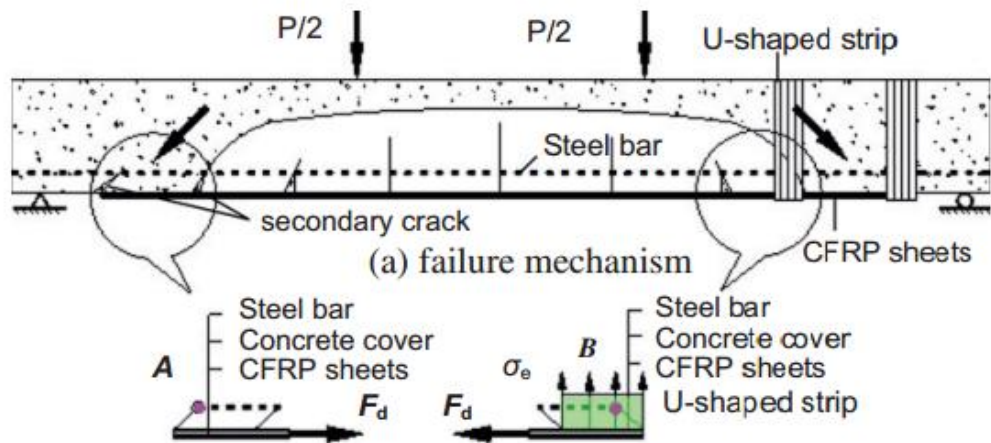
Brace arch model applied for low strength concrete beams strengthened with CFRP sheets for flexure and end anchored with U-wraps (Li et al. 2013)
